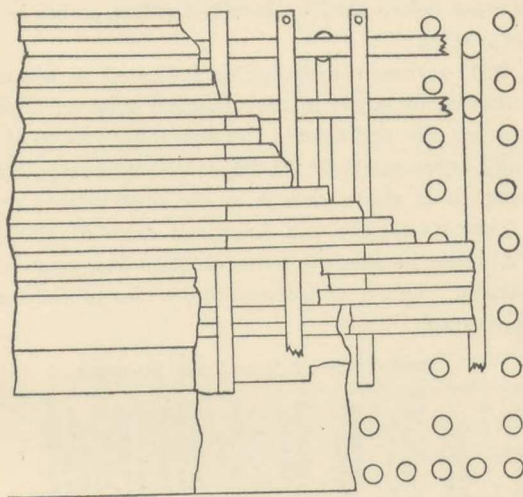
Plan of Piled Platform of Quay Wall, New York Harbour.
